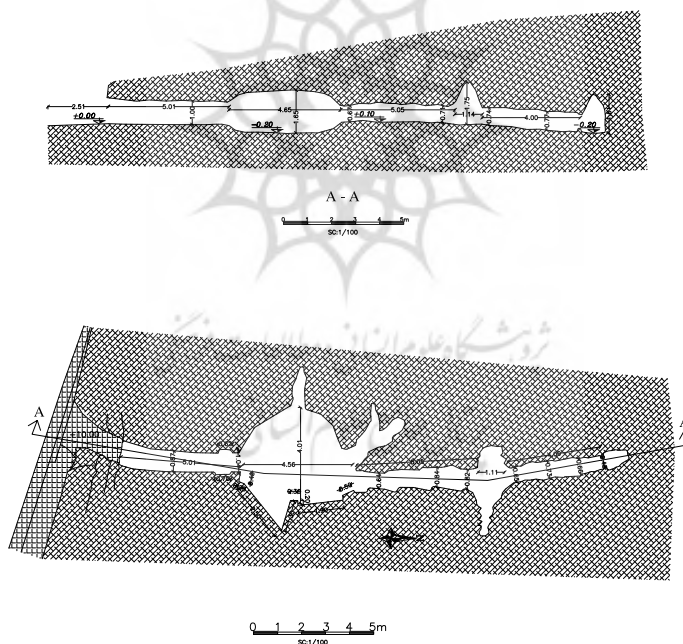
Plan and the Section of the Rock-cut Tunnel Complex in the Site
